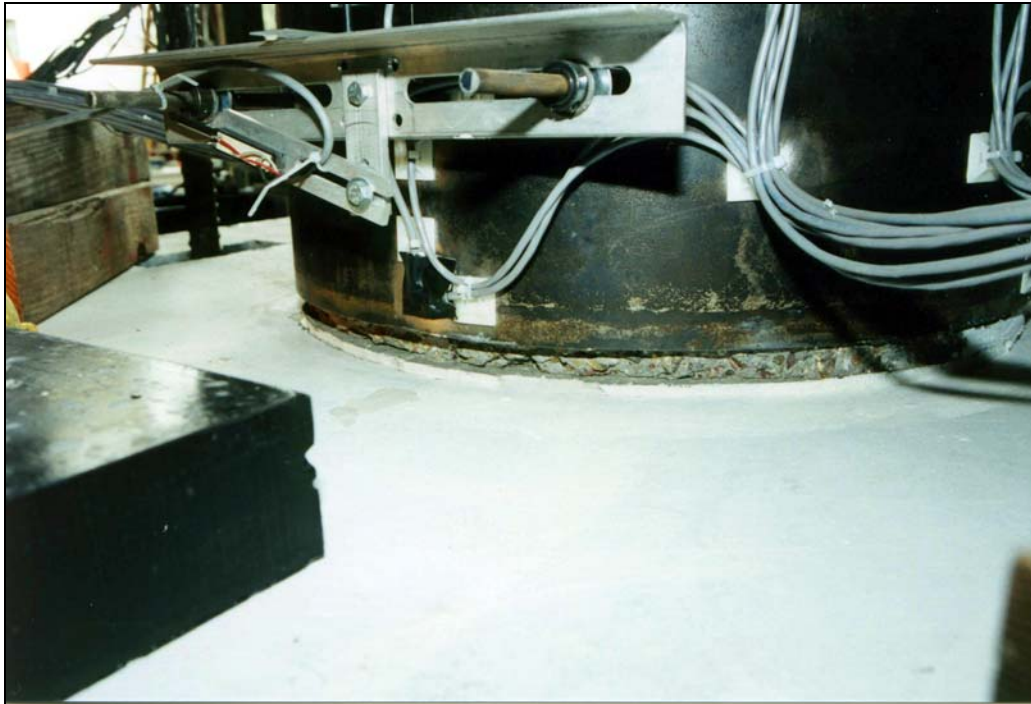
JH1 I Test 1 Damage below jacket at test end
